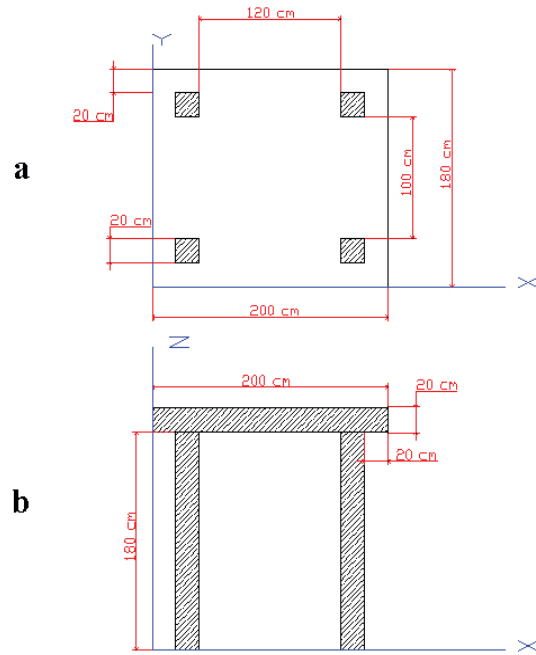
Timbering in tunnels: a: a vertical section of the wooden frame and b) a horizontal section of the wooden frame.
